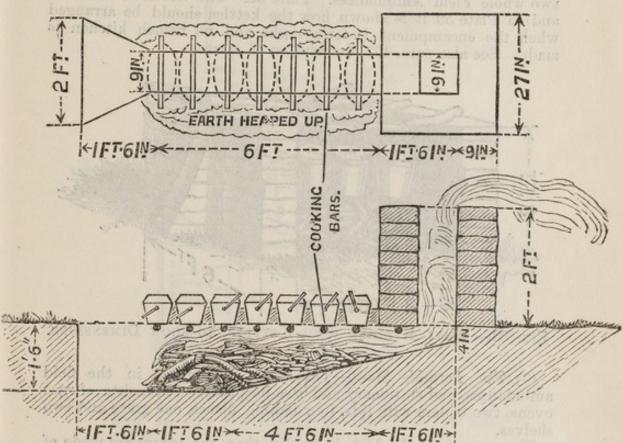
Plan and Sectional Elevation of Trench Kitchen with Camp Kettles, to show Dimensions and Detail.
